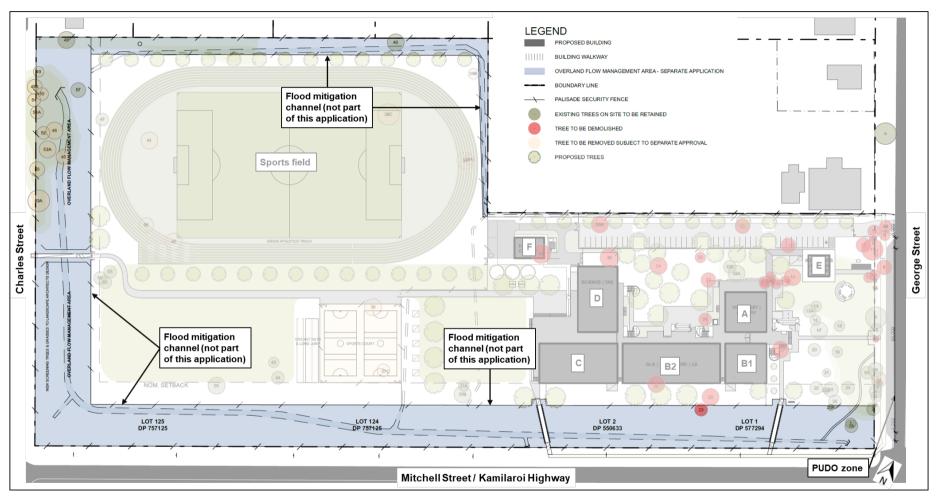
| On site Part 5 flooding and drainage infrastructure / mitigation works that do not form part of this application (highlighted orange) (Base source: Applicant's RRFI)
